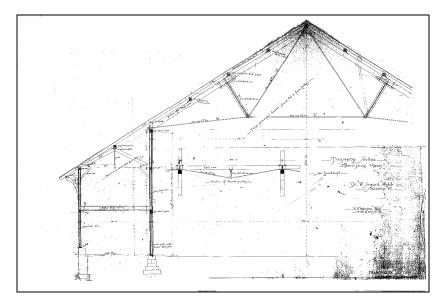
Robertson's earliest drawings of the roof frame omitted the ironcross-tie braces at plate level.
